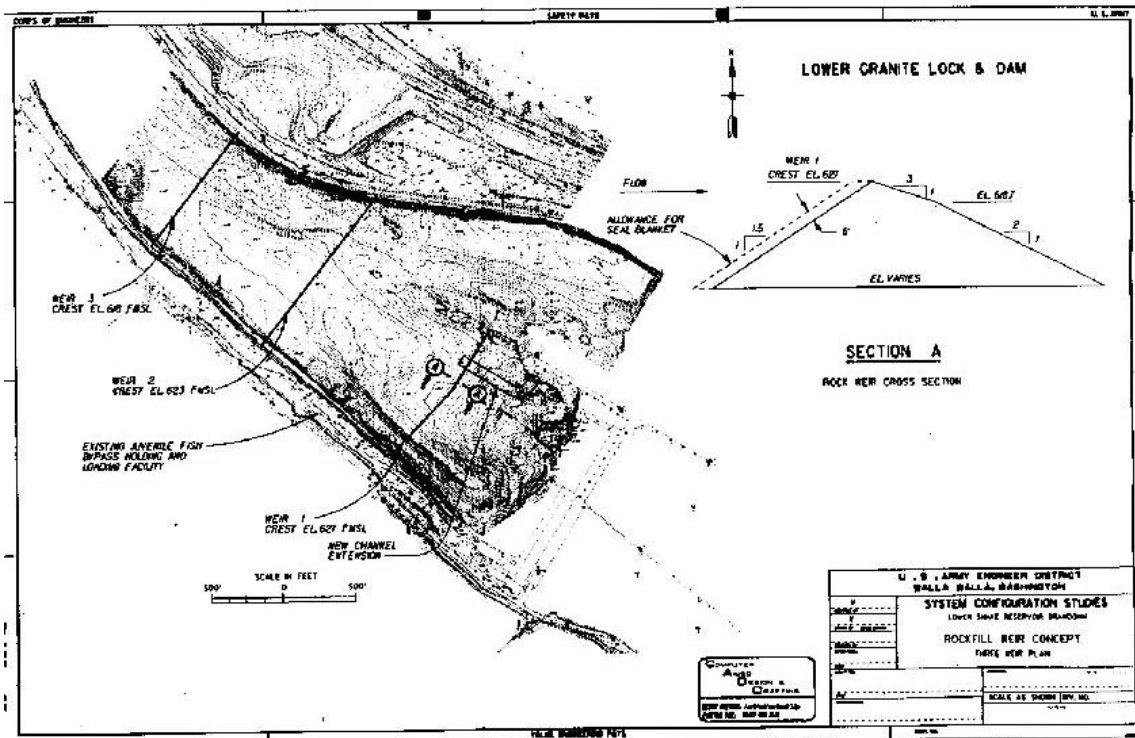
Rockfill Weir Concept--Three-Weir Plan
